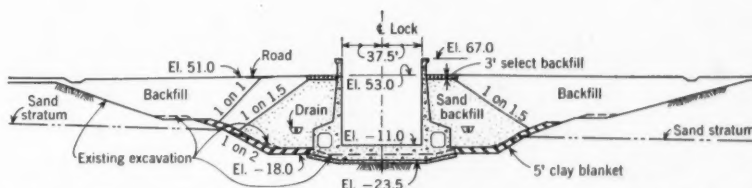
Typical section through lock basin. All the construction plant had to be set on levees above El. 67.
